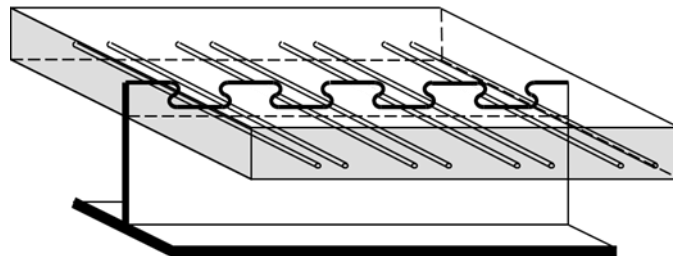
Cross Section alternative of the Precobeam designed by SSF Ingenieure, Munich
